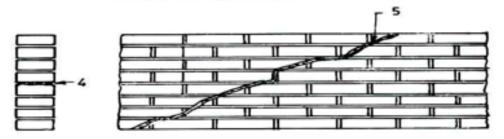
crack repair using 6 mm iron bars (left) and Hook bars in stone masonry wall (right)
